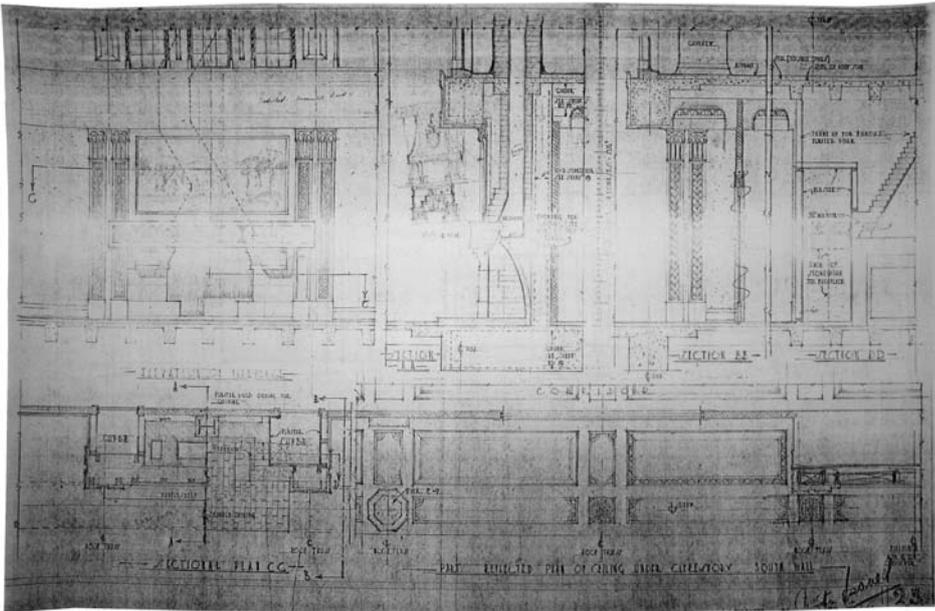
Lippincott, Sheet No. 25, 'Sectional Plan CC, Reflected Plan of Ceiling Under Clerestory South Wall'. Architecture Archive, Architecture Library, The University of Auckland (UoA Architecture Archive).
